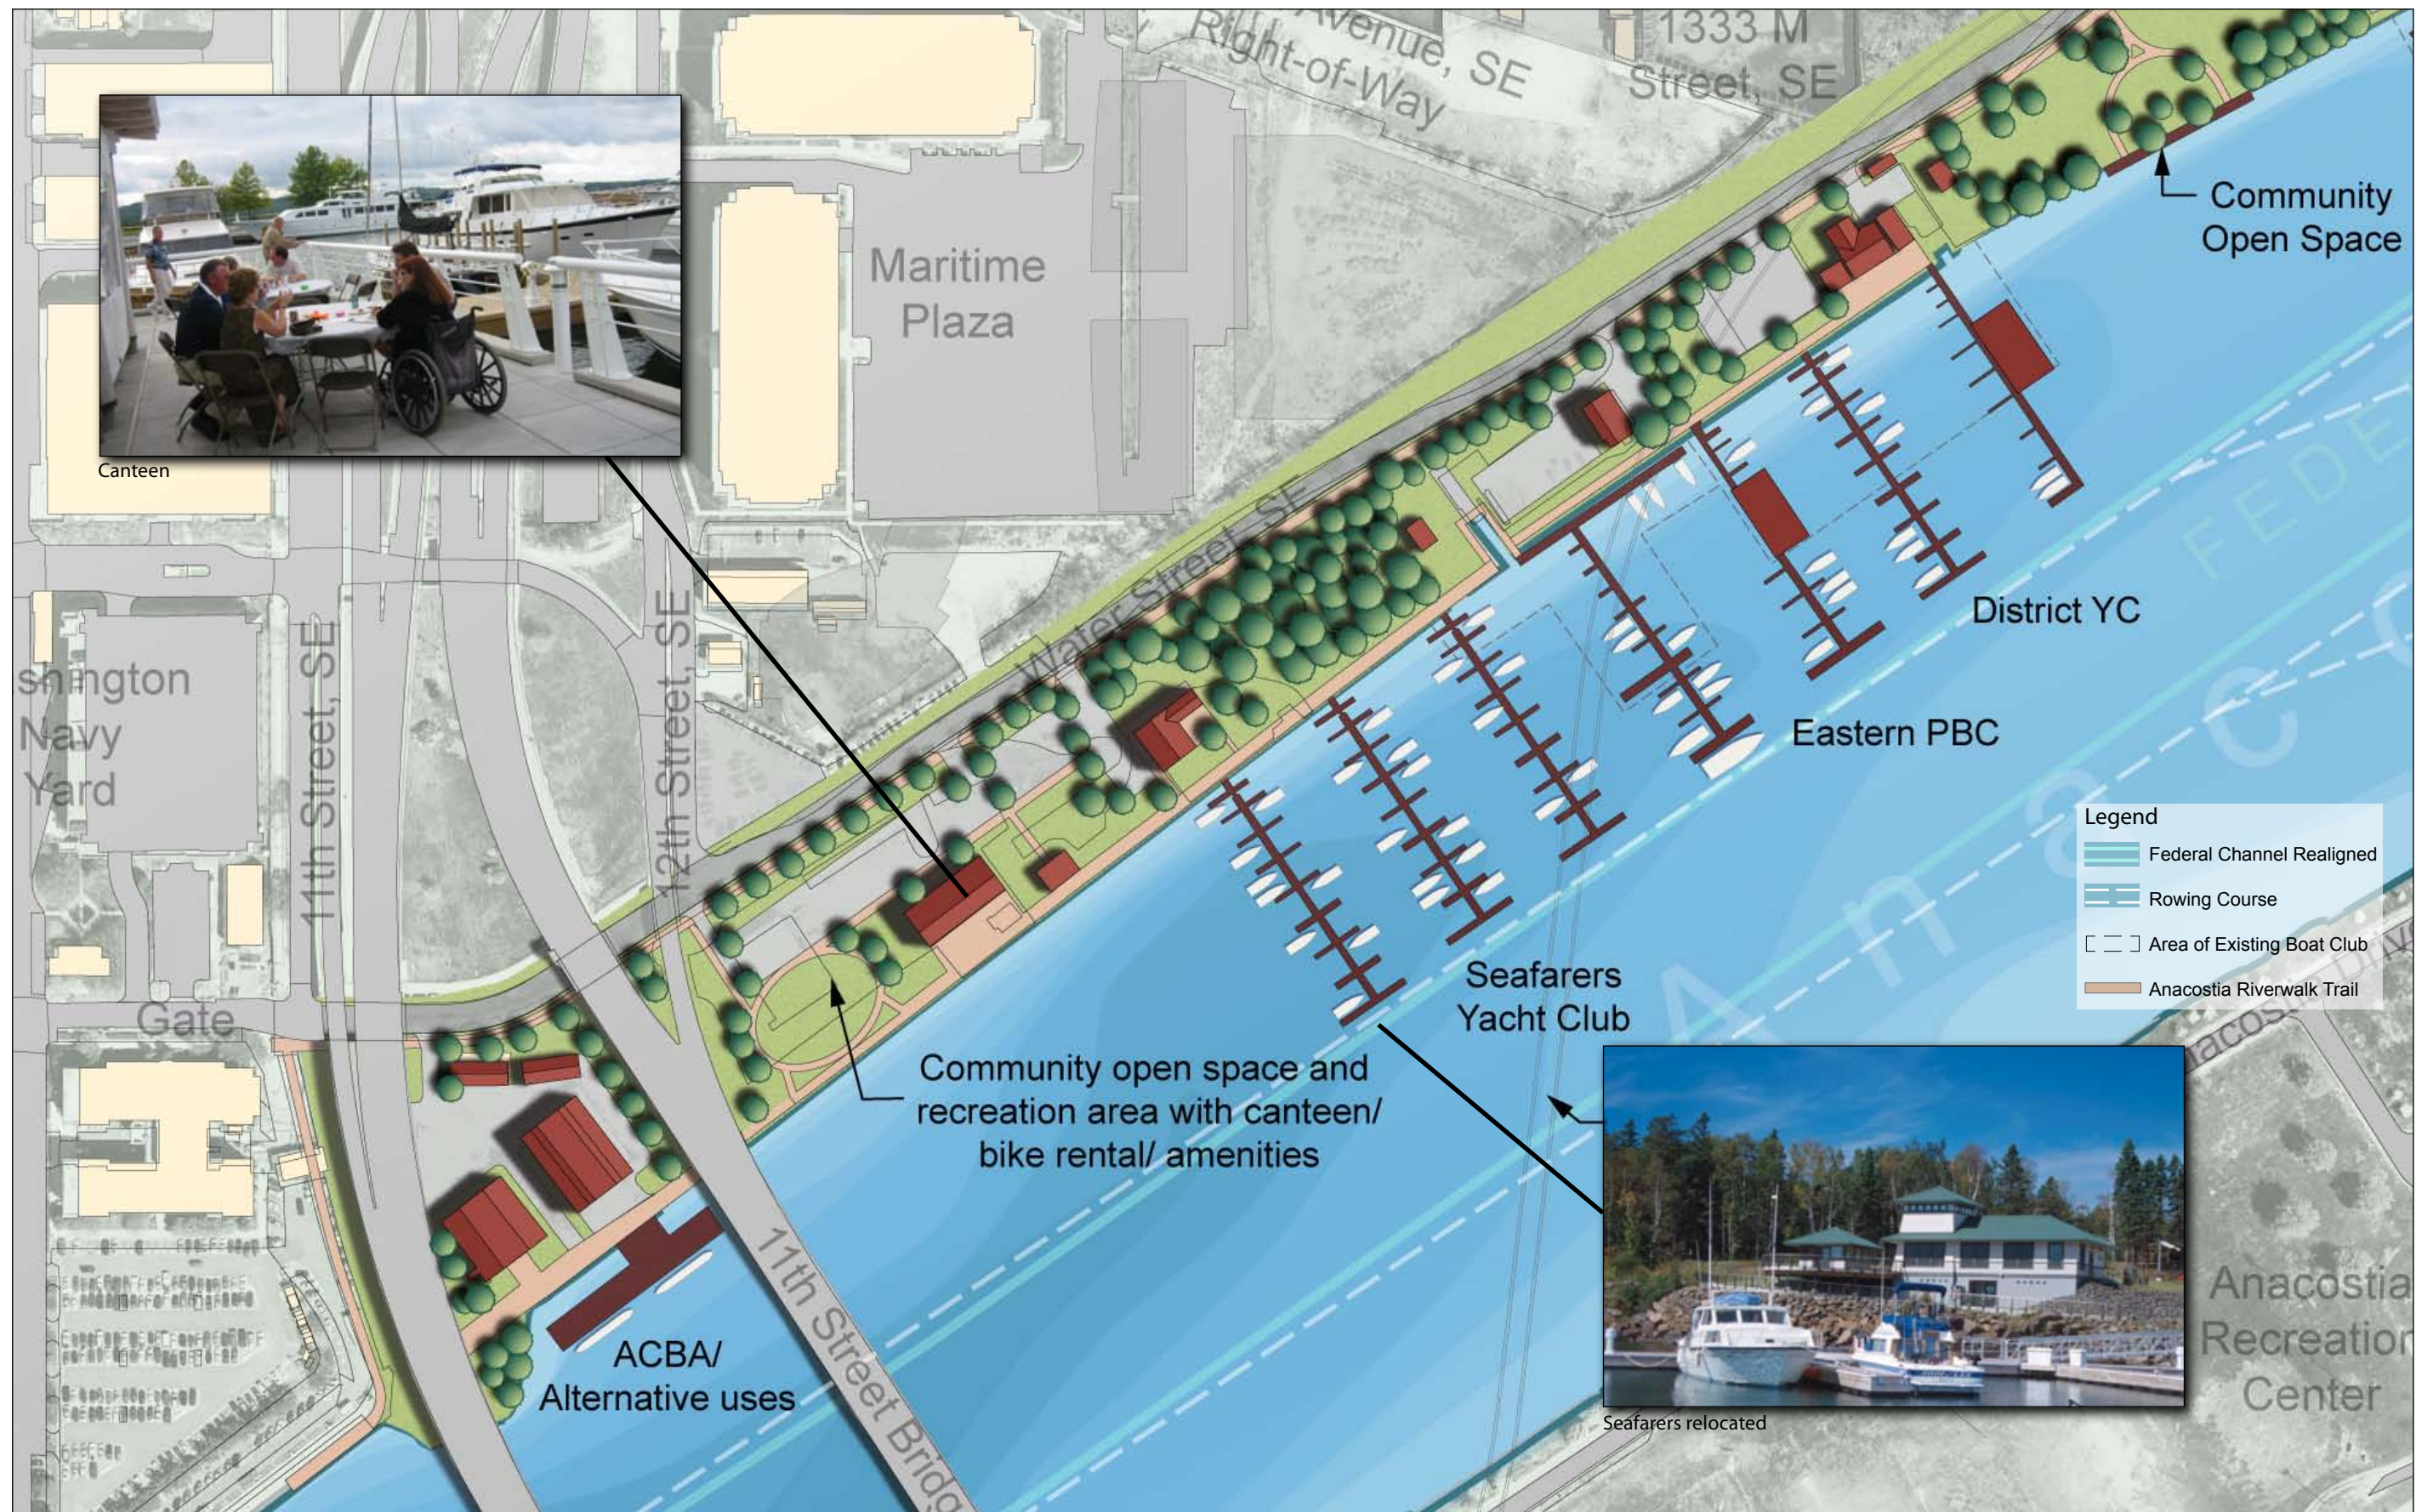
Enlarged plan of Concept 2 - West Section
